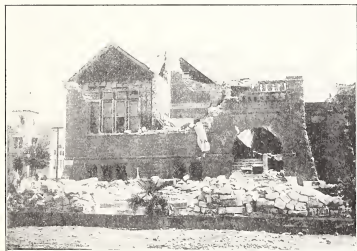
Carnegie Library, Santa Rosa. A Typical Brick Building with Wooden Interior Framing; the Outer Walls Faced with Cut Stone. Buildings of This Type of Construction Invariably Were Shattered near the Roof Lines. The Picture Is Representative of the Behavior of Stone-faced Buildings with Inadequate Wood Framing.
